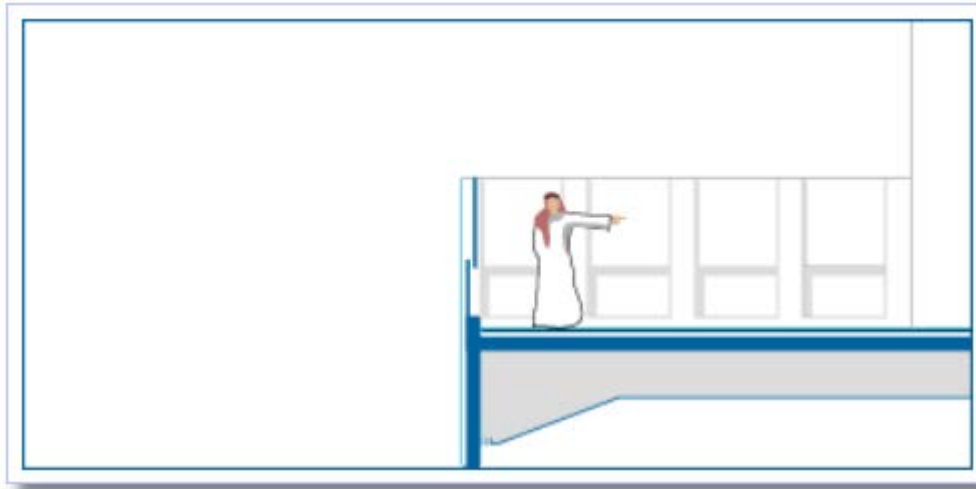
Example of horizontal windcatcher (Source: Lockerbie, 2021)
